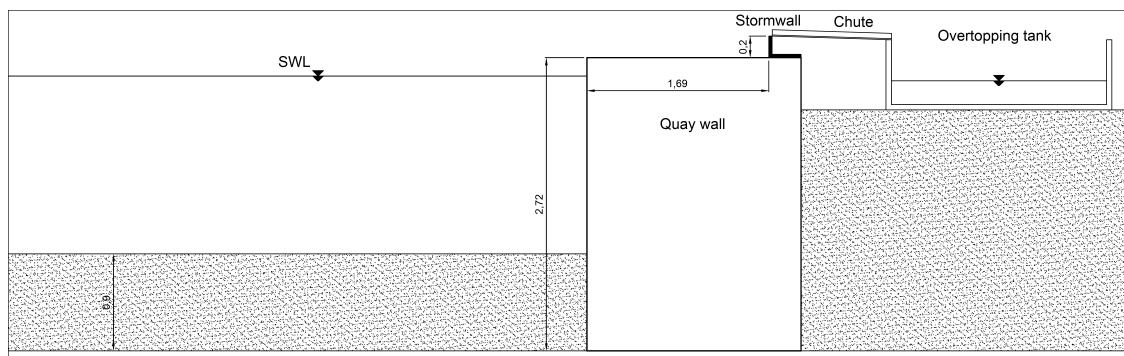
Design of the quay wall (geometry ‘quay wall’)
